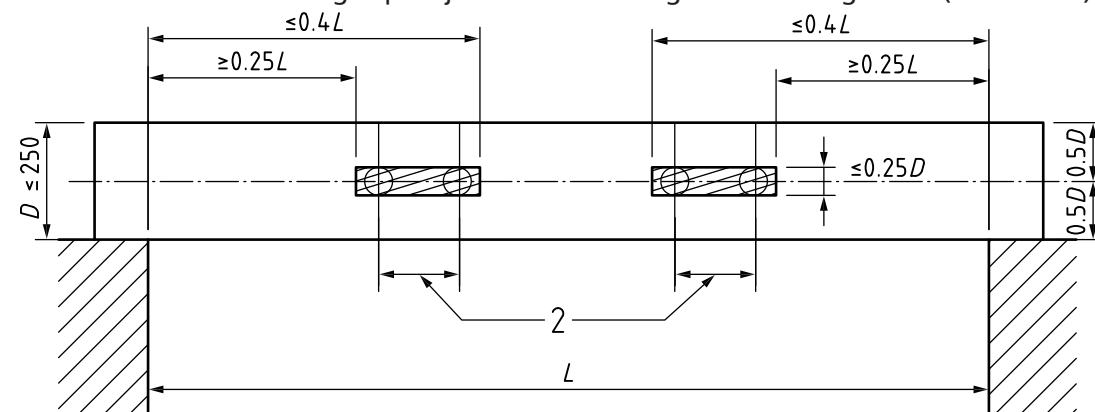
Limits for notching and drilling of solid timber floor joists (1 of 2)
